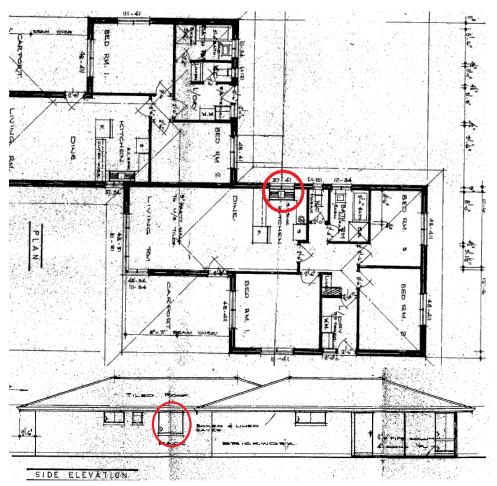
Diagram highlighting major opening to kitchen on northern elevation of dwelling at No. 52A Lockhart Street, Como.
